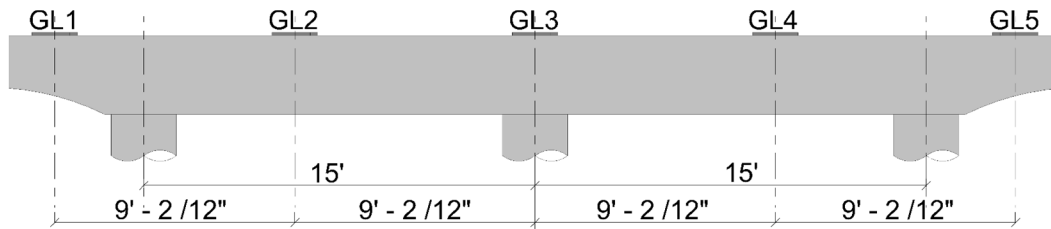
Bent cap girder lines (GL) and support spacing dimensions
